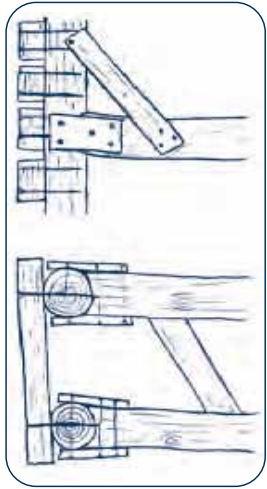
BRIDGE STRINGER SUPPORT AND CROSS BRACING
